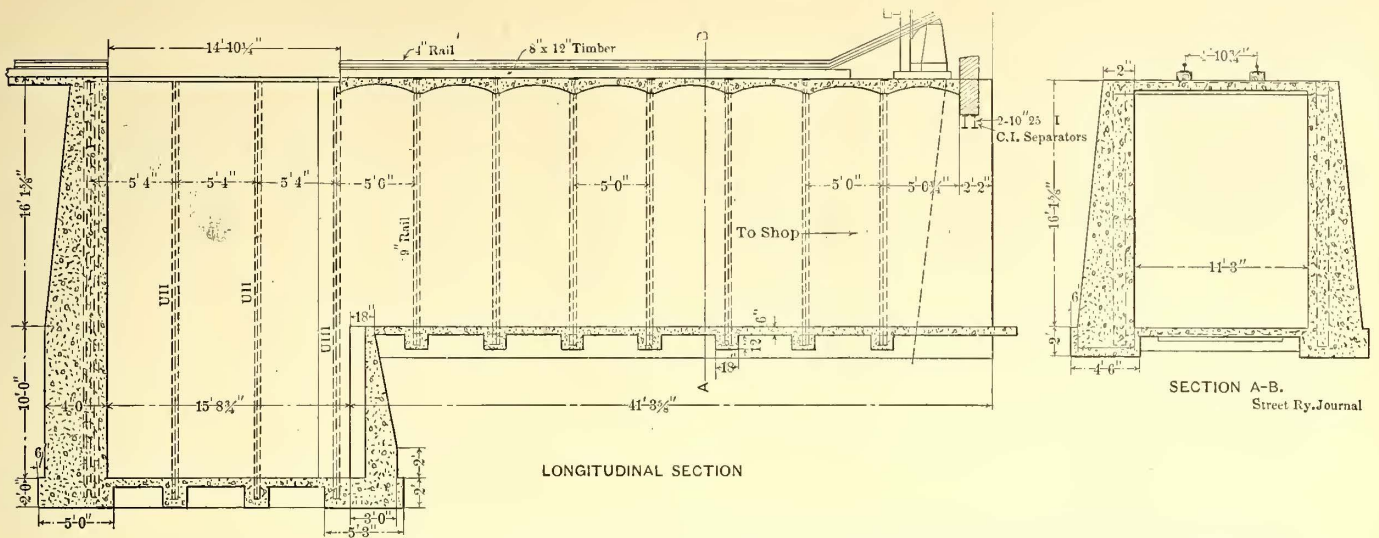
LONGITUDINAL AND CROSS-SECTIONS OF THE TUNNEL UNDER THE ELEVATOR TRACK OF INSPECTION SHED AT THIRTY-SIXTH STREET, USED FOR CONVEYING TRUCKS TO THE OVERHAULING SHOP
